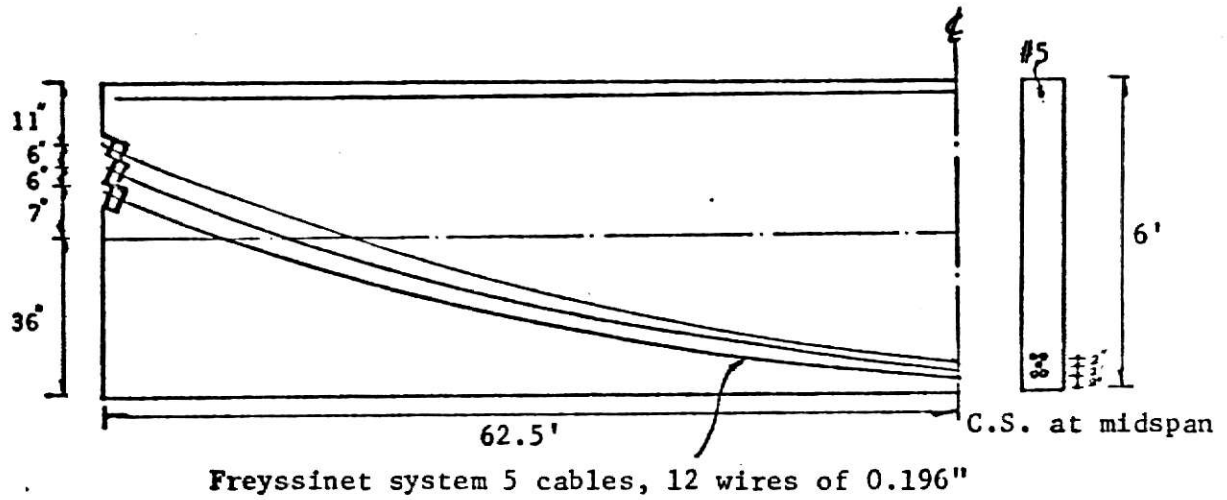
Prestressing Cables in the Edge Beam of P/C Shell
